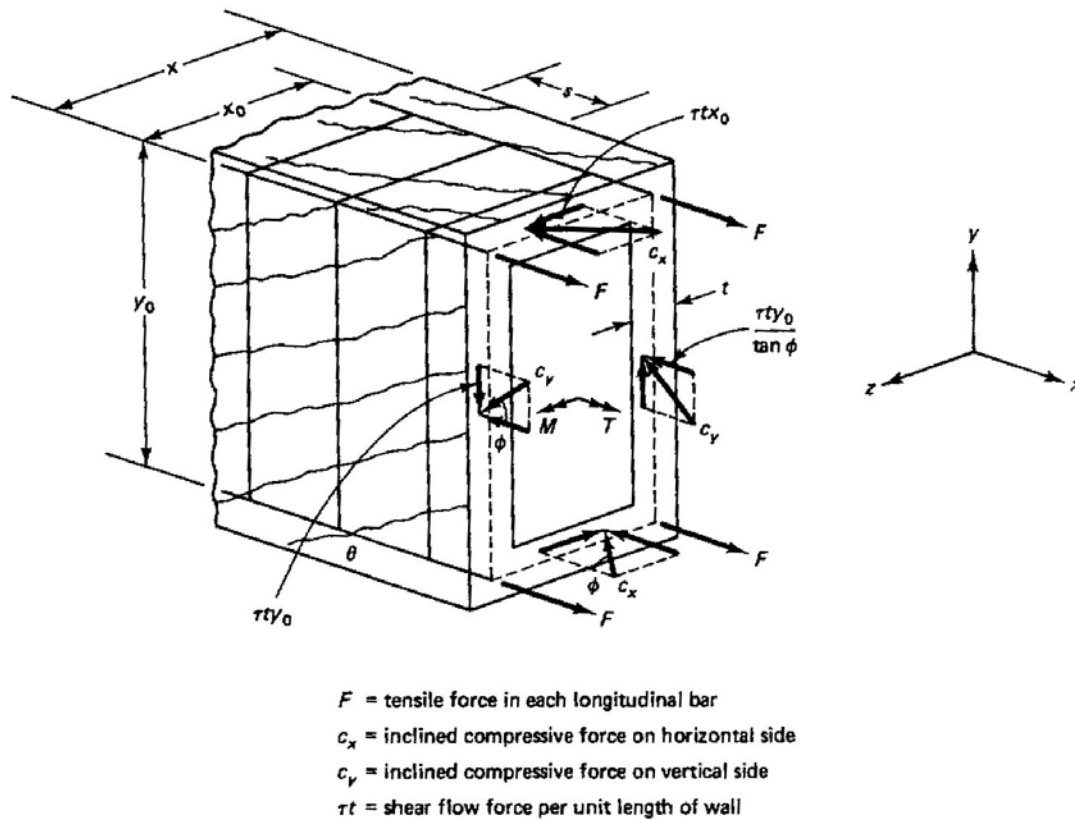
Forces on hollow-box concrete surface by truss analogy.
